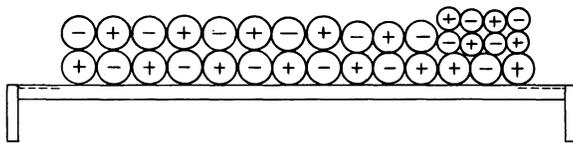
Pairing of Talking Conductors on Cable Rack—Typical Section (See 2.03.)
